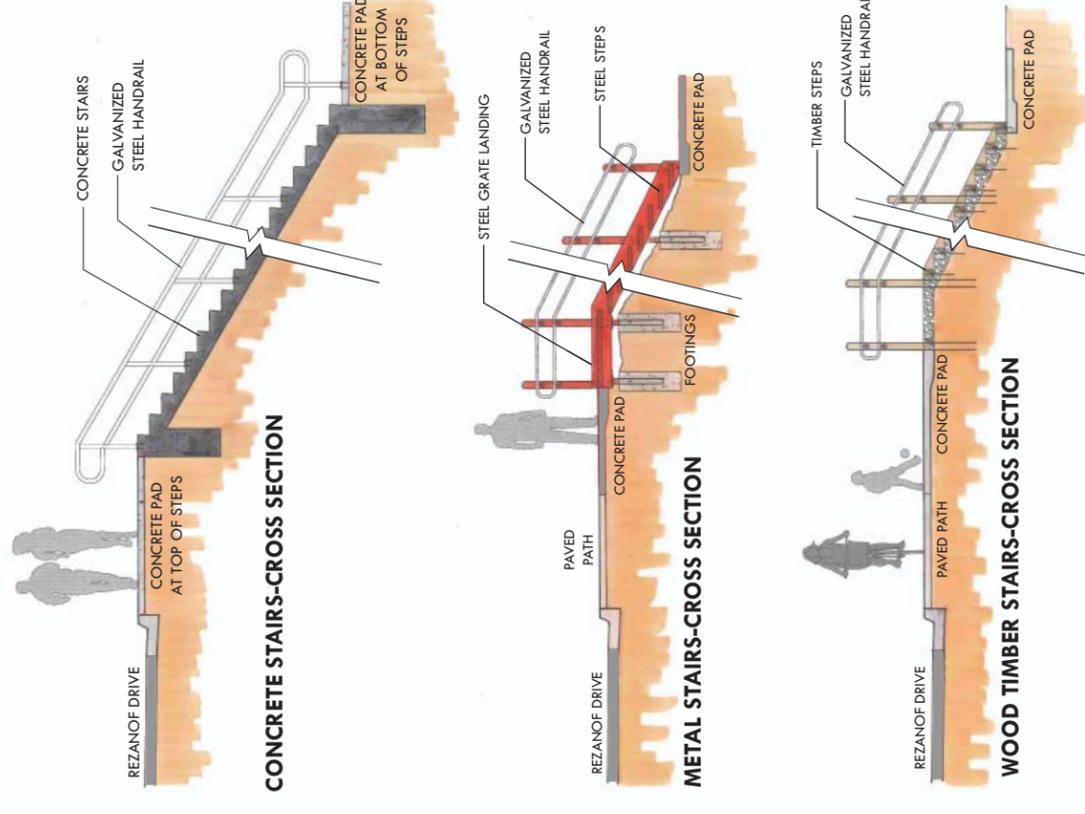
Sections of potential stair types including concrete, metal, and wood. Given the steep existing slope the concrete and wood stairs would require additional fill. The B1-B project design and construction cost estimate is based on an estimate completed in 2004 for a metal stair design.
